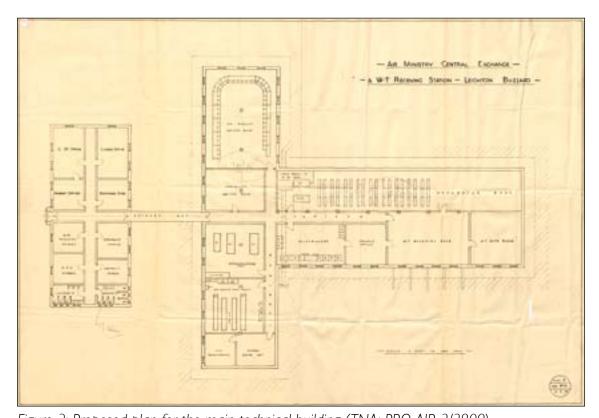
Proposed plan for the main technical building (TNA: PRO AIR 2/2809).
